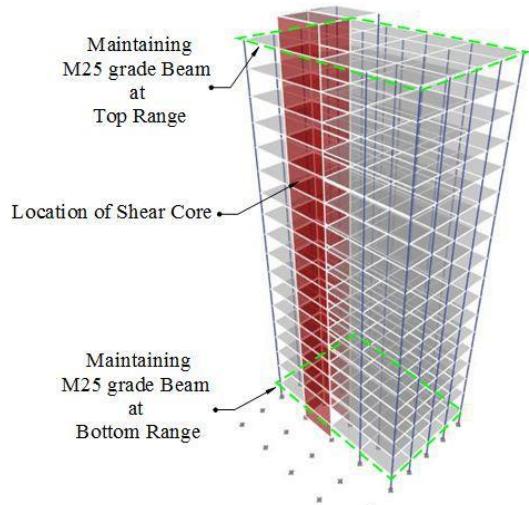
Beam Stability Case - Beams of same sizes (All M25 grade beams): Case BS1
